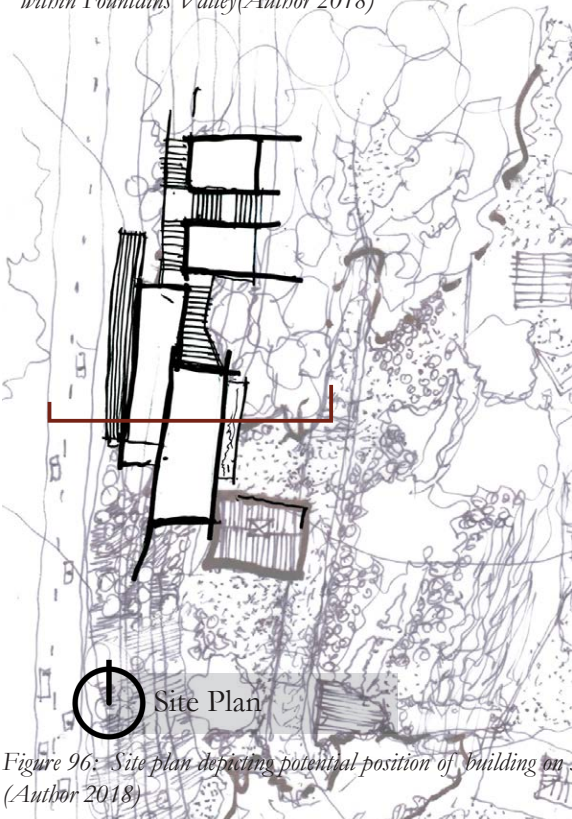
Site plan depicting potential position of building on site (Author 2018)
